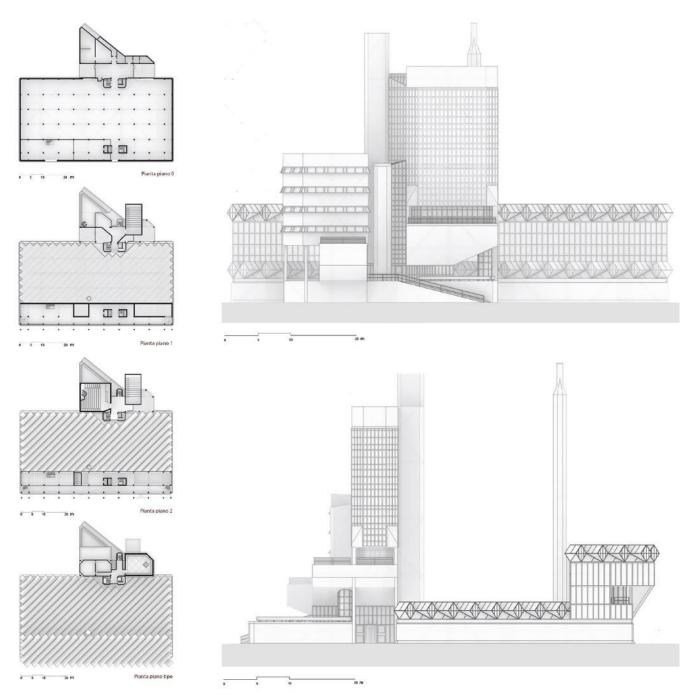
Plans and front views of the Leicester Engineering Department Building by Stirling e Gowan. Source: images created by the authors.
